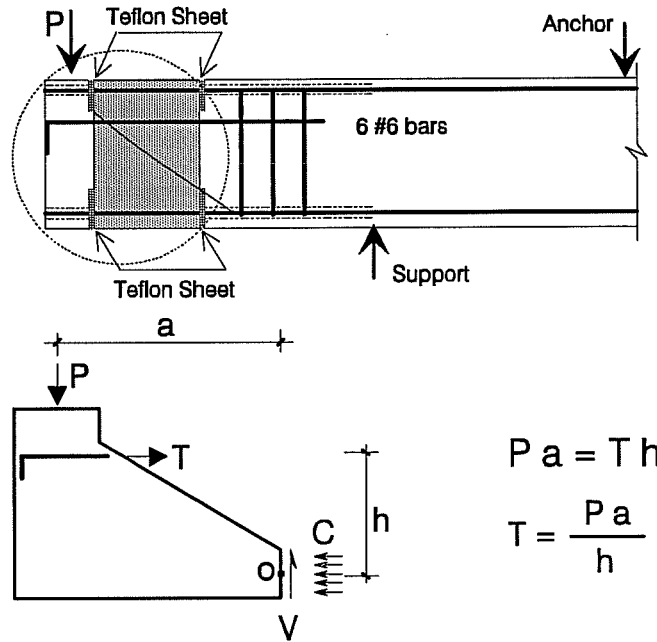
The Separating Diagram of End Concrete Block under the Test without Transverse Reinforcement
